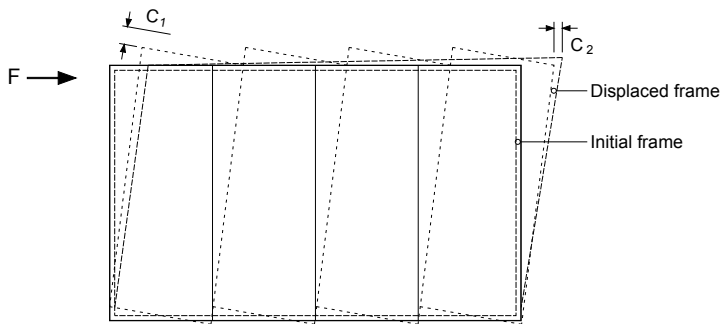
In-plane shear deformations in the longitudinal joints between sandwich panels, C_1 and in the edge joints between the sandwich panels and the supporting structure, C_2 (Davies, 2001)
